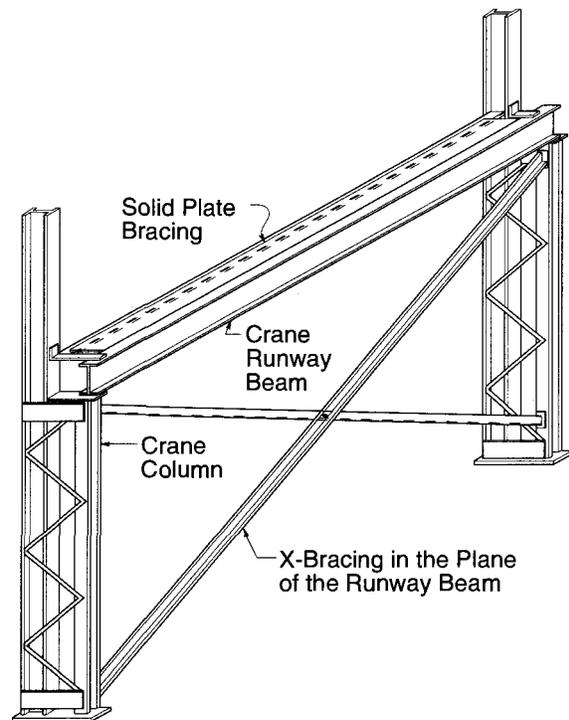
Vertical Bracing for Heavy Cranes
